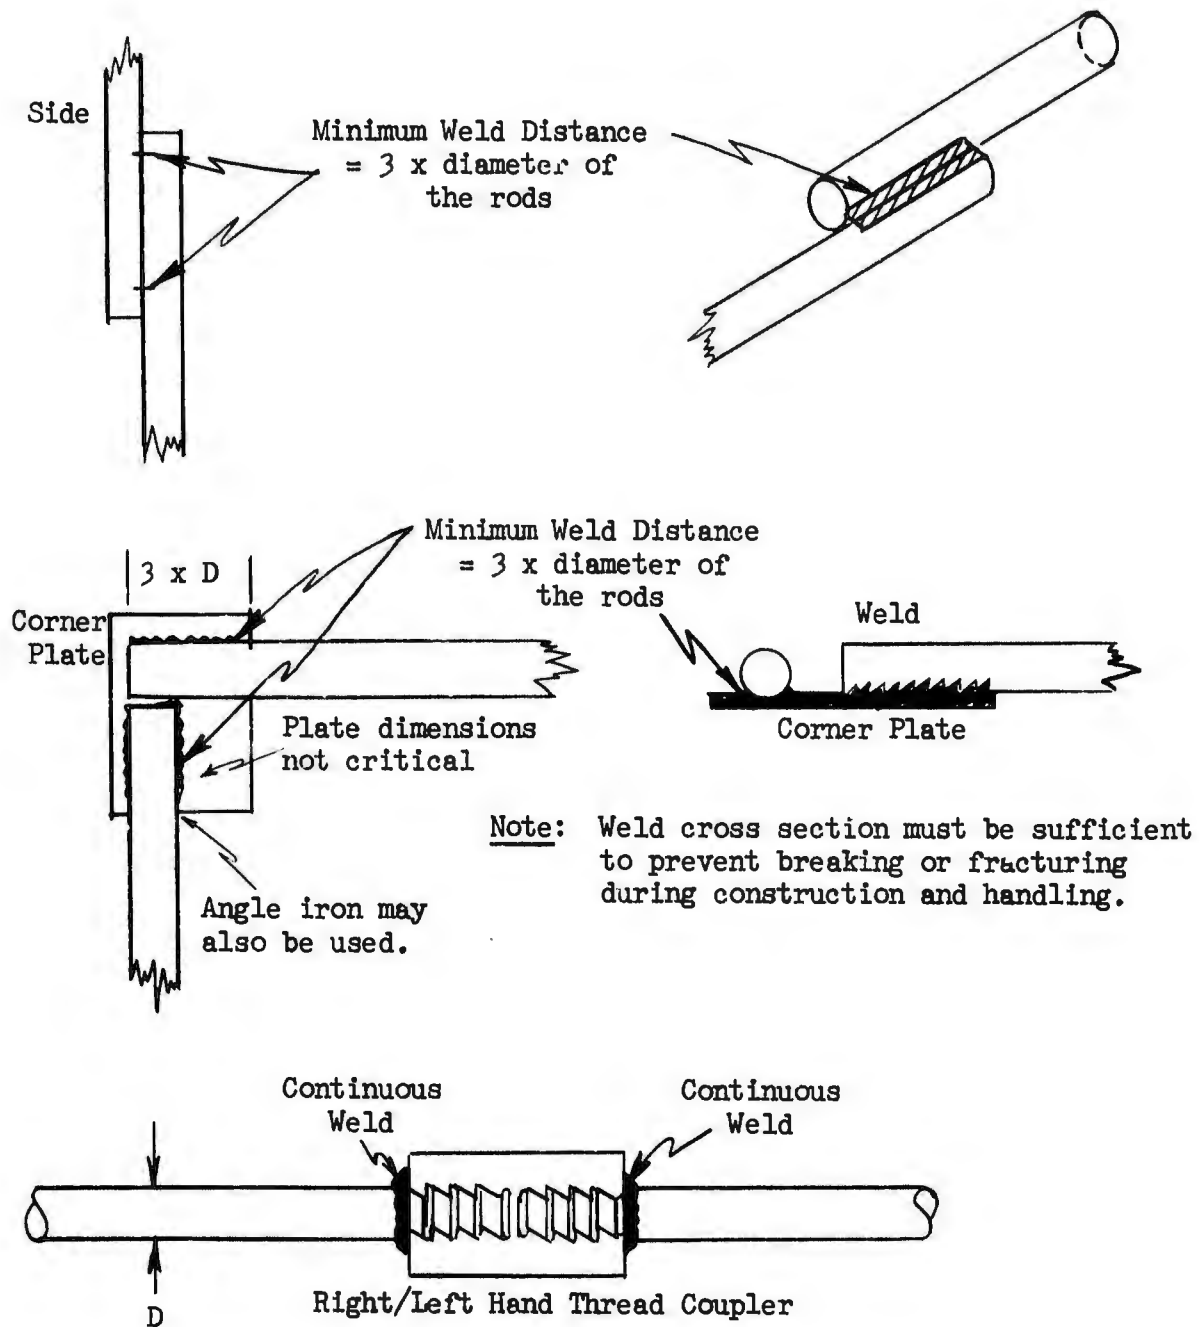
Reinforcing Steel Rod (Rebar) Welding Details
